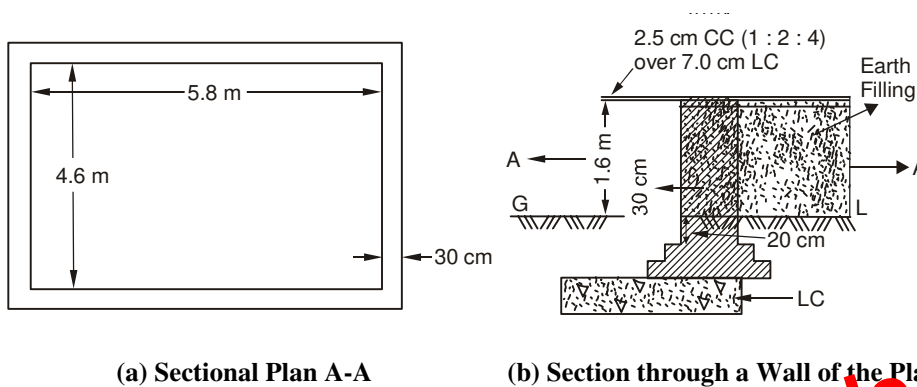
Brick-Masonry Platform – [Not to Scale]
